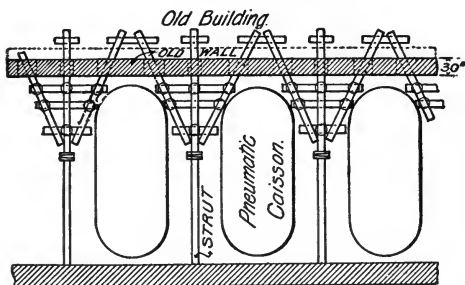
Needle-beams used in Shoring at Standard Oil Co.'s Building.
